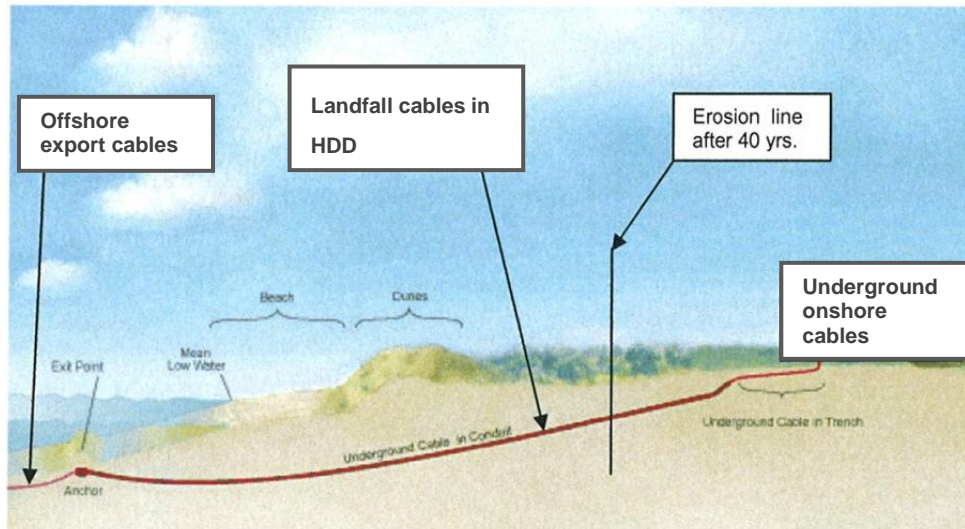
Typical landfall cable arrangement (not to scale) (Courtesy ABB)
